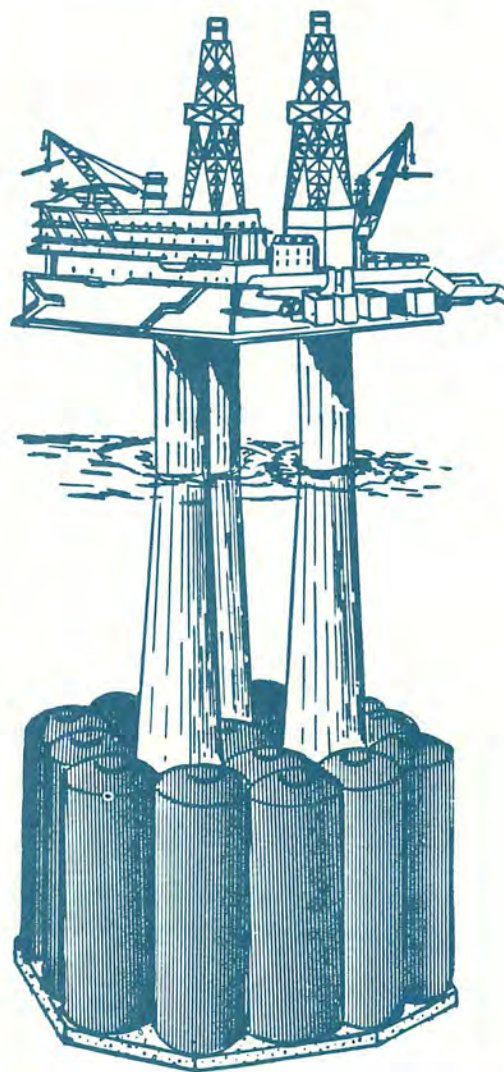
Multi-Tower Concrete Gravity Base Structure.
